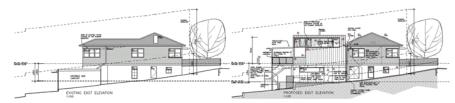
East (side) elevation (Steven Spizick Architect, 2021)
